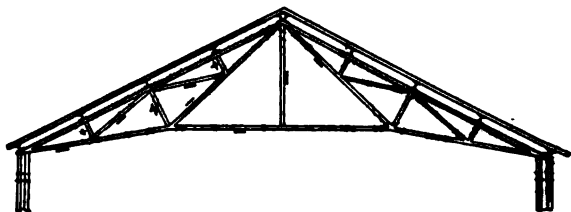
French Truss. Spans from Forty to Eighty Feet
